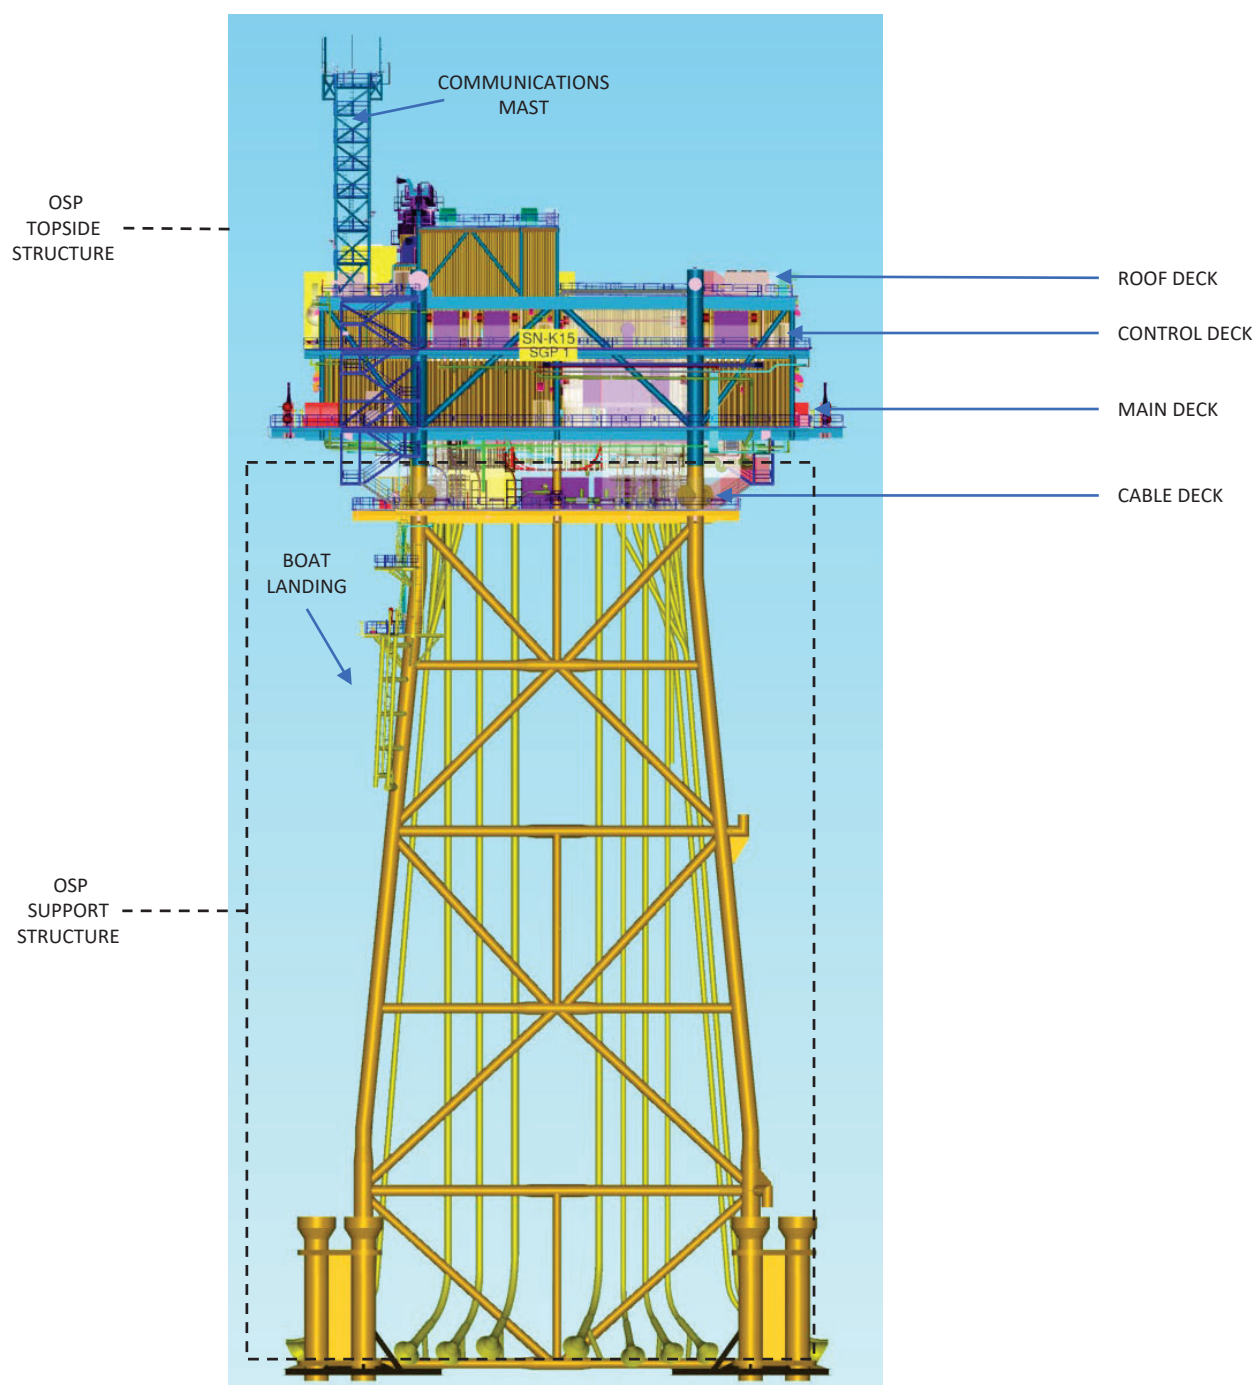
OSP General Arrangement - Elevation looking towards Platform East
